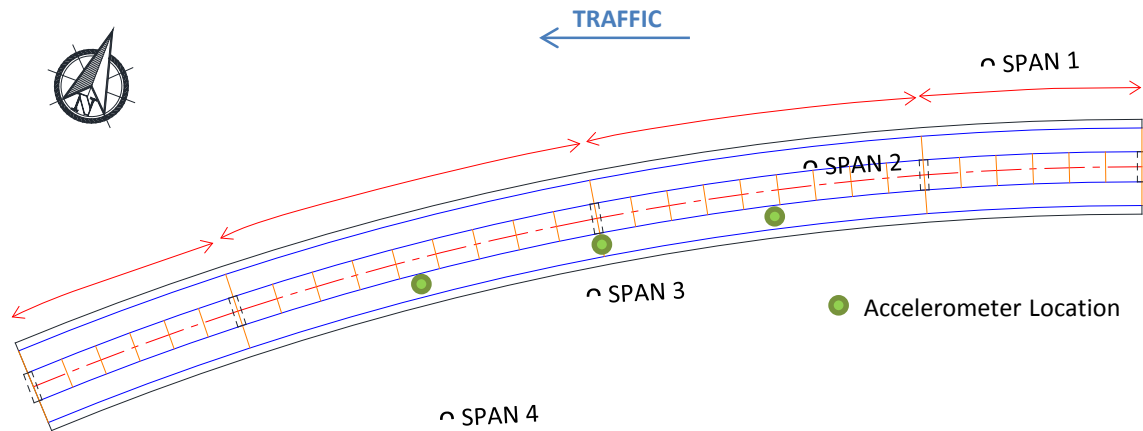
Plan view of the I-5/I-205 Interchange Bridge showing accelerometer locations.
